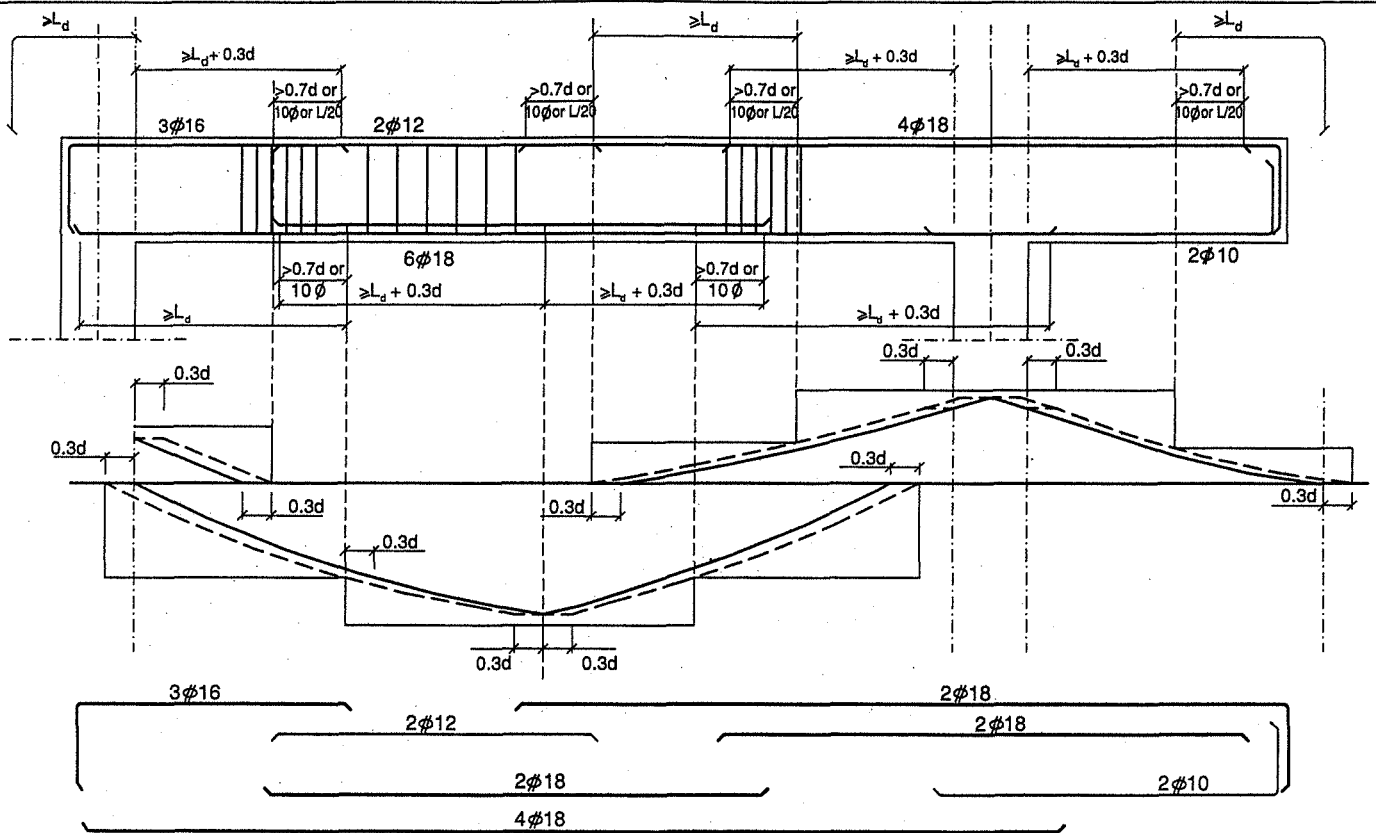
Curtailment of bars for beam B2 (straight bars)
